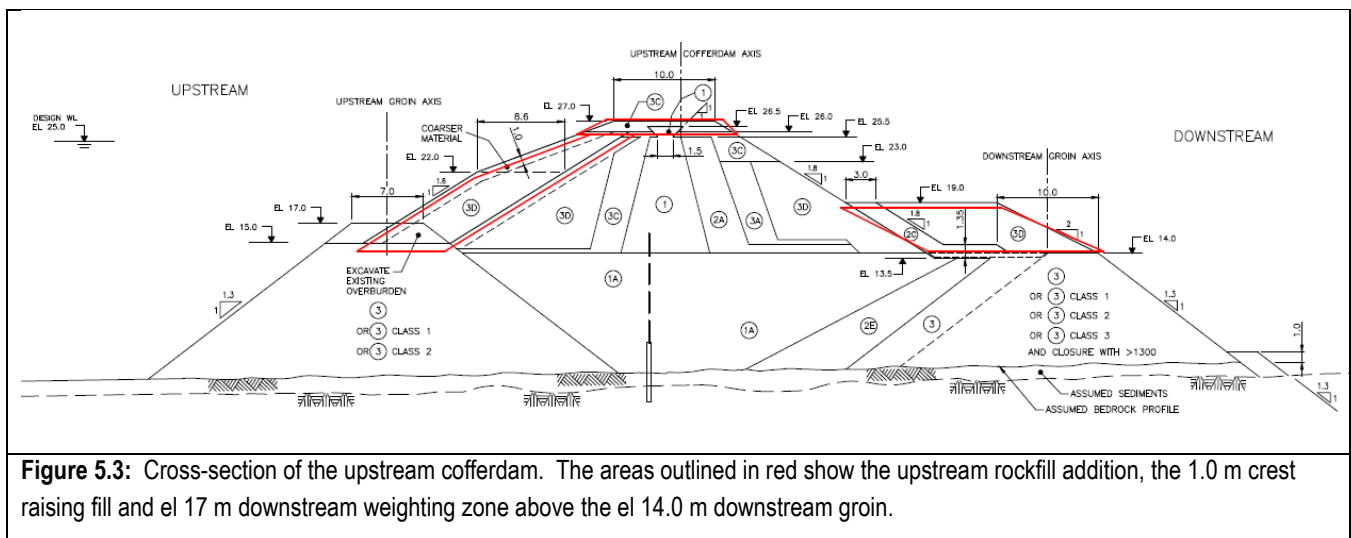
Cross-section of the upstream cofferdam. The areas outlined in red show the upstream rockfill addition, the 1.0 m crest raising fill and el 17 m downstream weighting zone above the el 14.0 m downstream groin.
